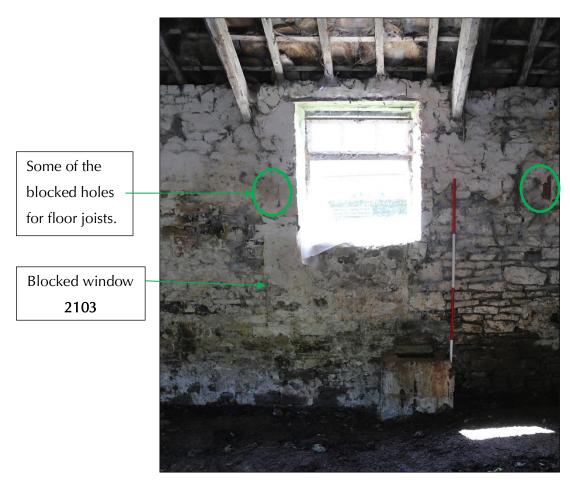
showing current window opening (2101) and blocked window (2103) and the level of the blocked holes for floor joists.
